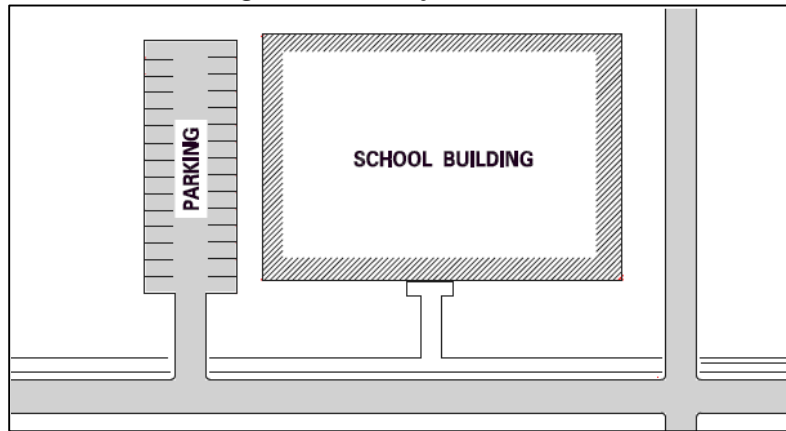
is an example of an elementary school building that is surrounded by either streets or driveways. The school has limited sidewalk access along one street and students may be exposed to vehicular traffic onsite in order to get to the playfield.
